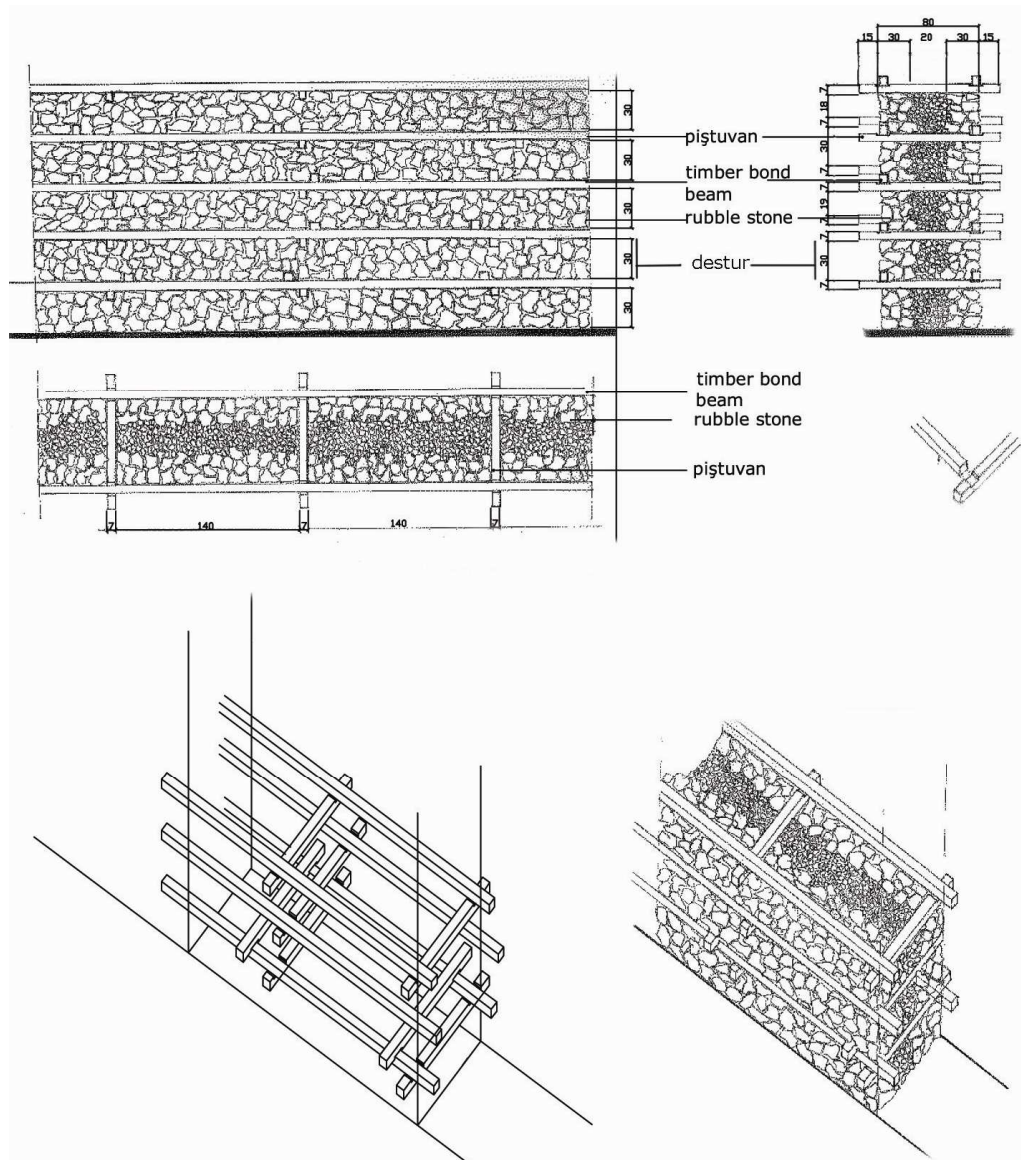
5 Drawing of wall type 1. Çelik 2008.
